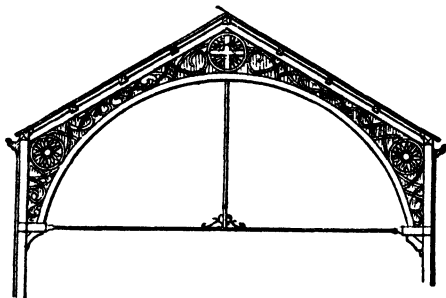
Truss for Metropolitan Concert Hall, New York City
